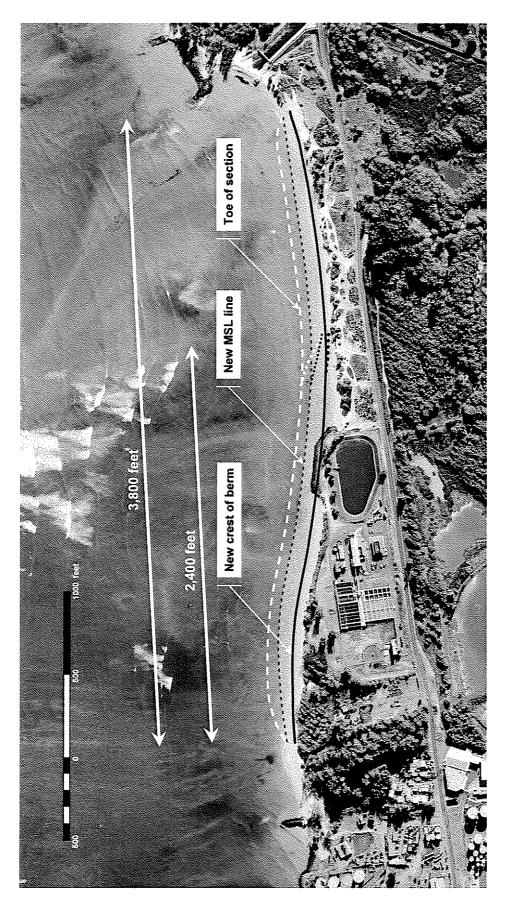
Plan view of the beach replenishment alternatives at the WWRF site.
